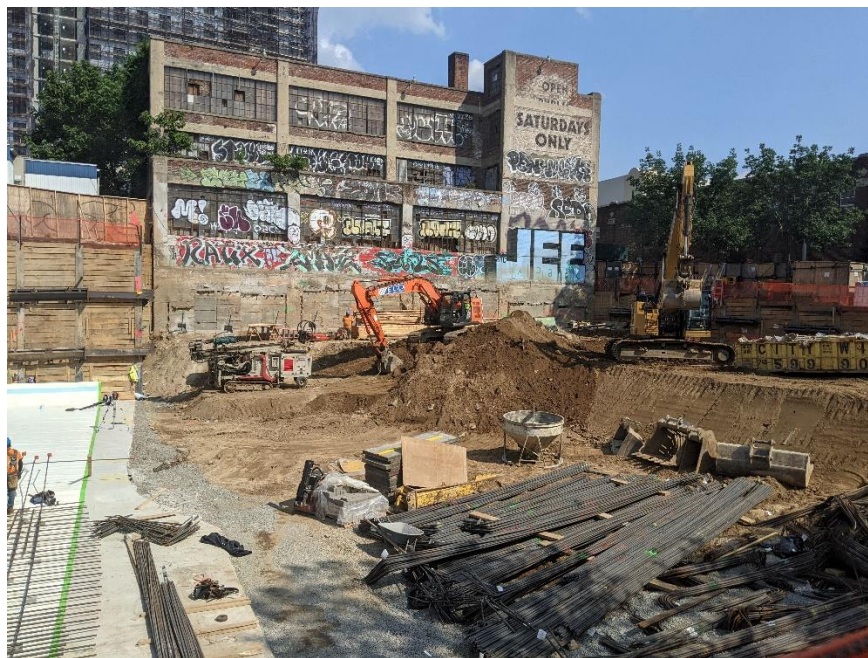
View of ECD grading the northern part of the site, facing southeast.
